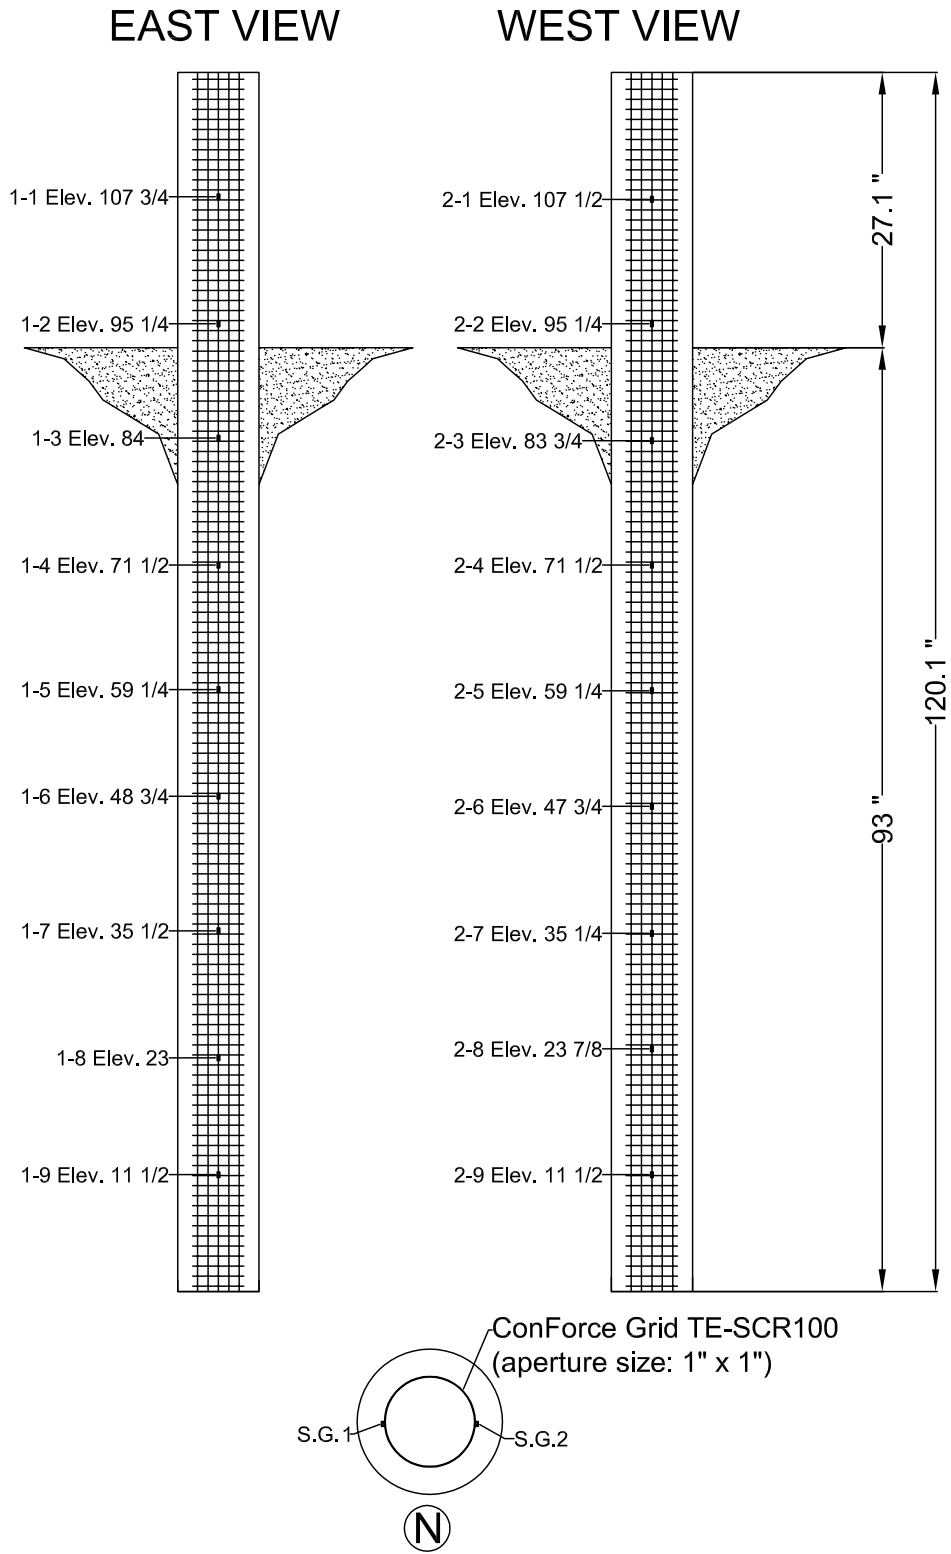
Pile 2. Schematic of the location of the strain gauges installed on the geogrid reinforcement and pile cross section.
